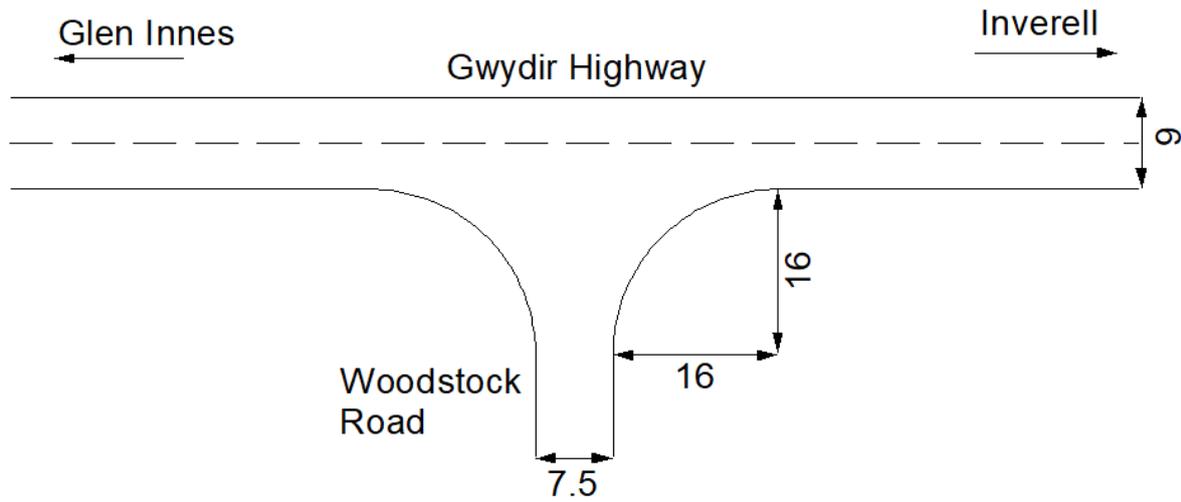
Woodstock Road/Gwydir Highway intersection dimensions
